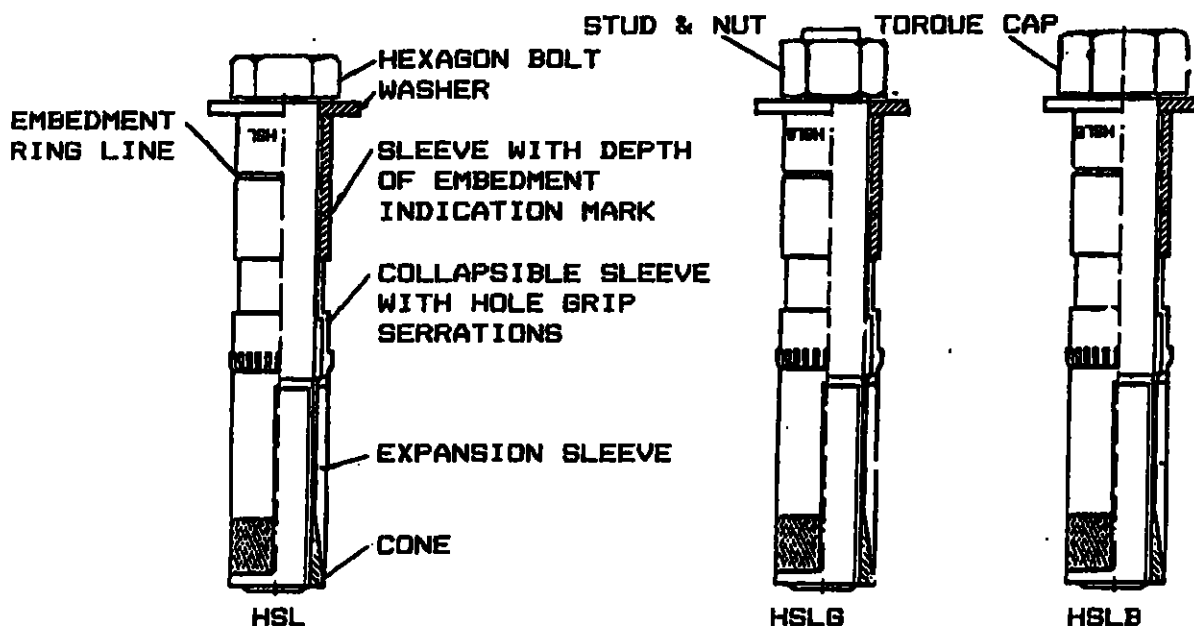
HSL METRIC CONCRETE ANCHORS
